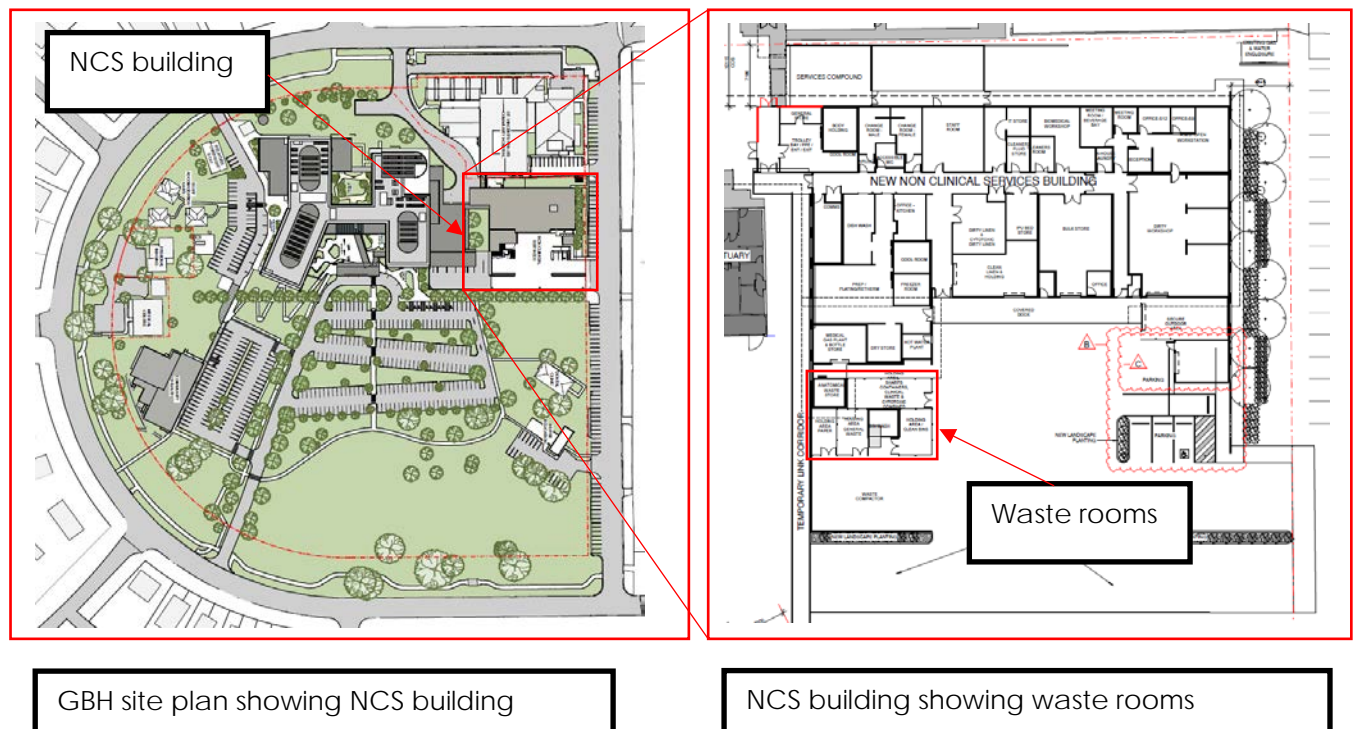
Site plan showing location of Non-Clinical Support (NCS) building and the location of the waste storage rooms and loading dock area within the NCS building
